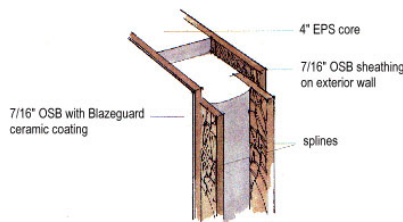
Cross-section of Structural Insulated Panel (SIP).
